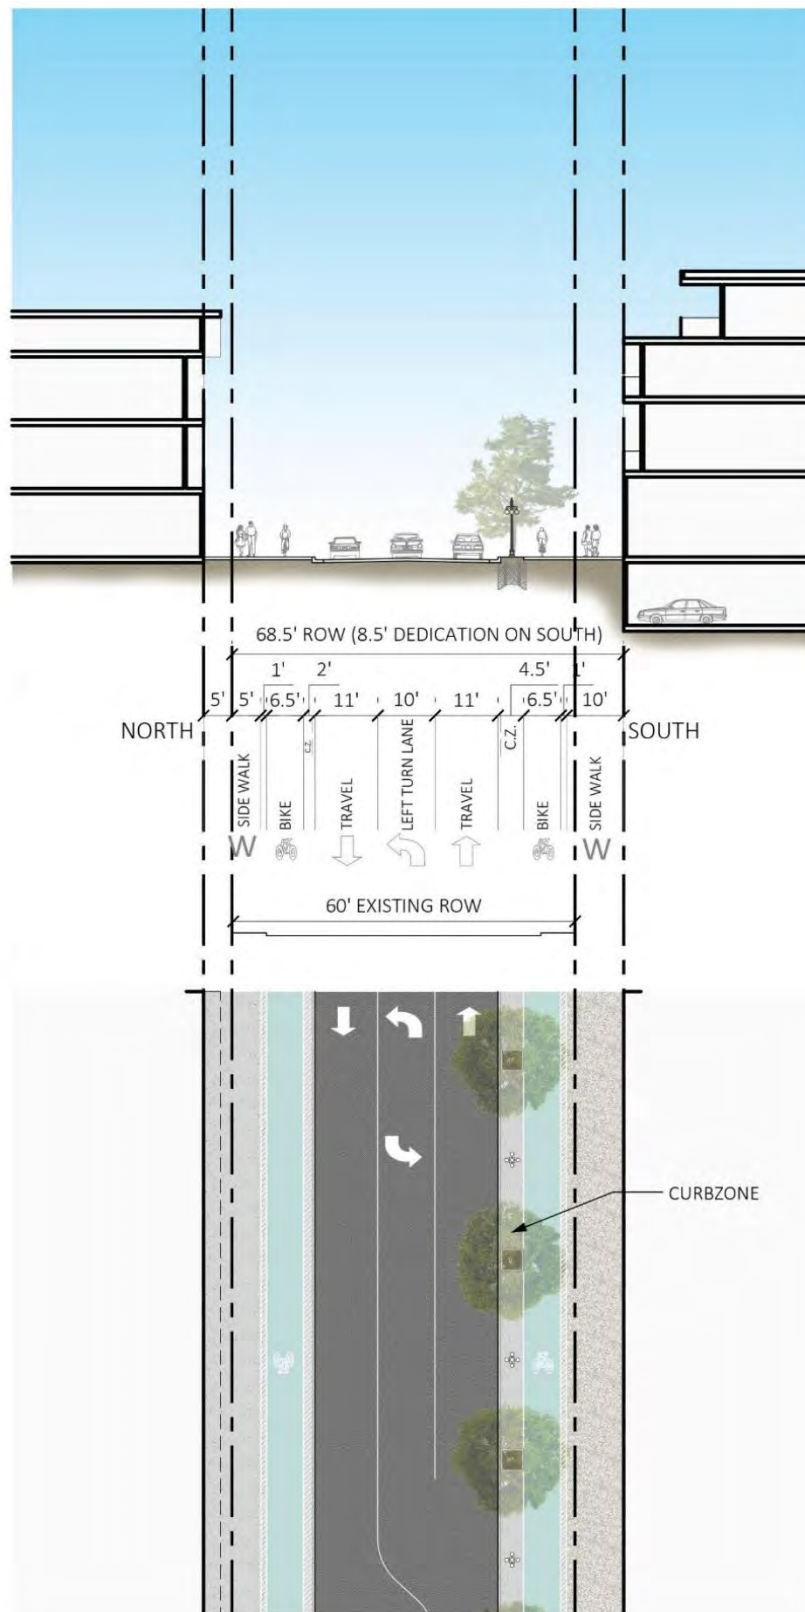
Laurel Street Between Pacific Avenue and Front Street (2)
